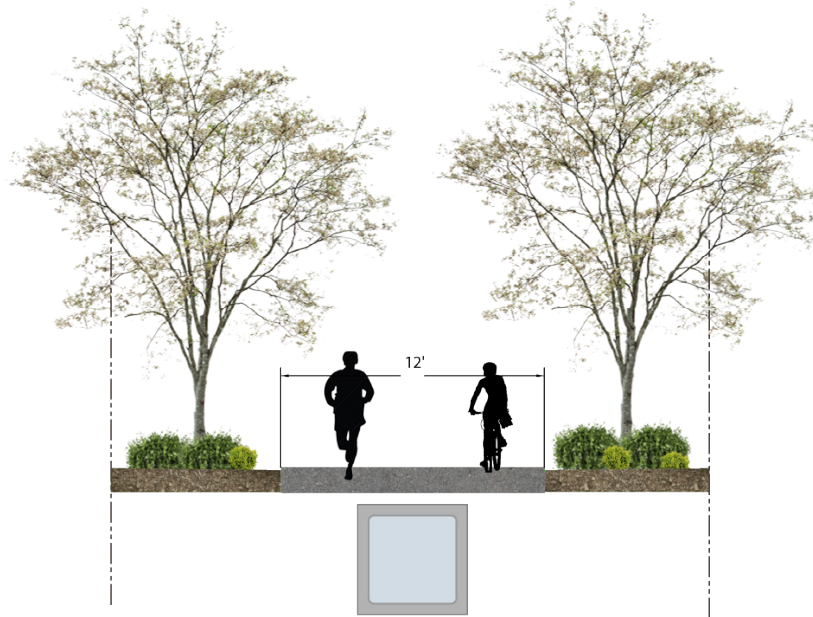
Jordan and Salt Lake City Canal Trail typical sections of trail over canal enclosure.
